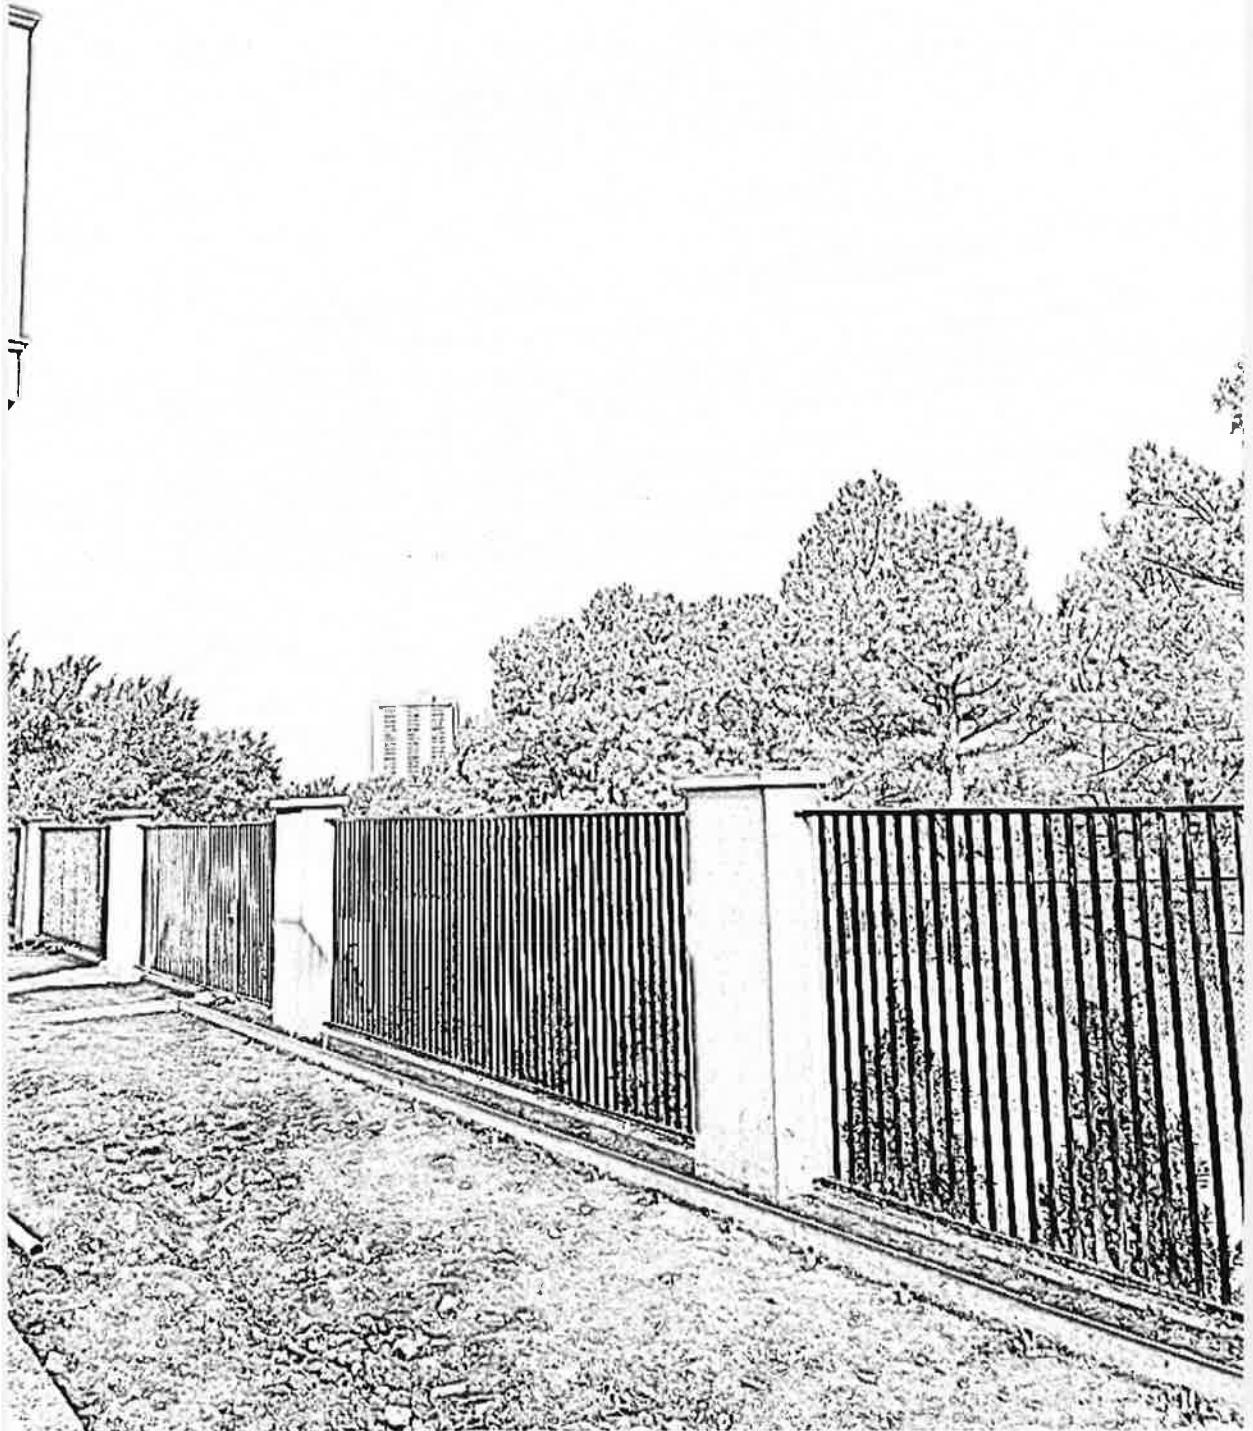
" – Conceptual Wall / Fence Diagrams (North Elevation)
